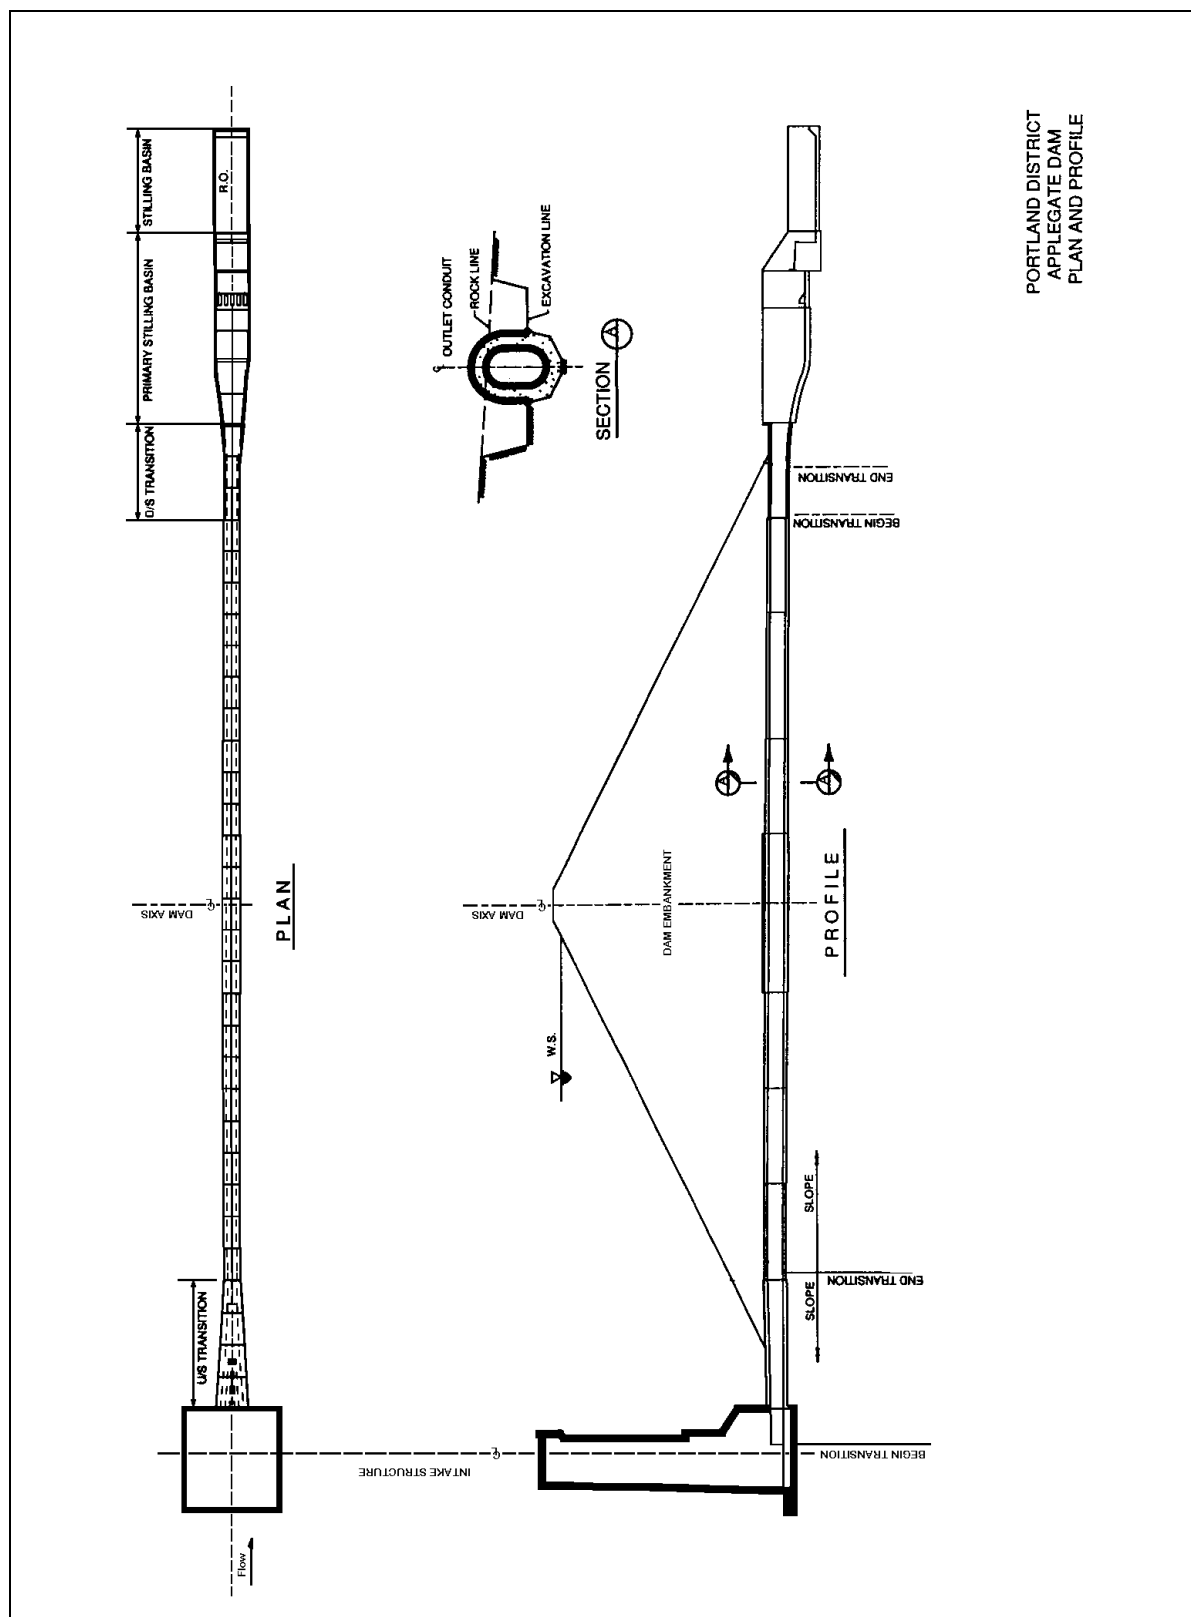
Outlet works under embankment dam, Applegate Lake, Oregon
